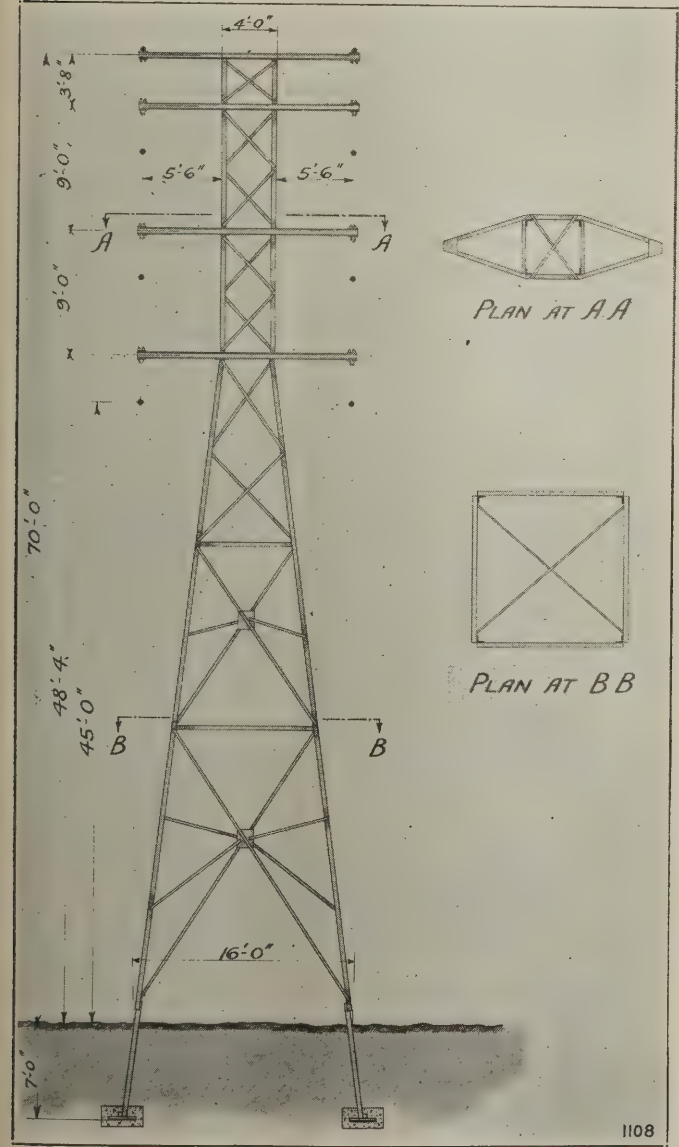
THE DETAILS OF A 2/0 STEEL TOWER.
